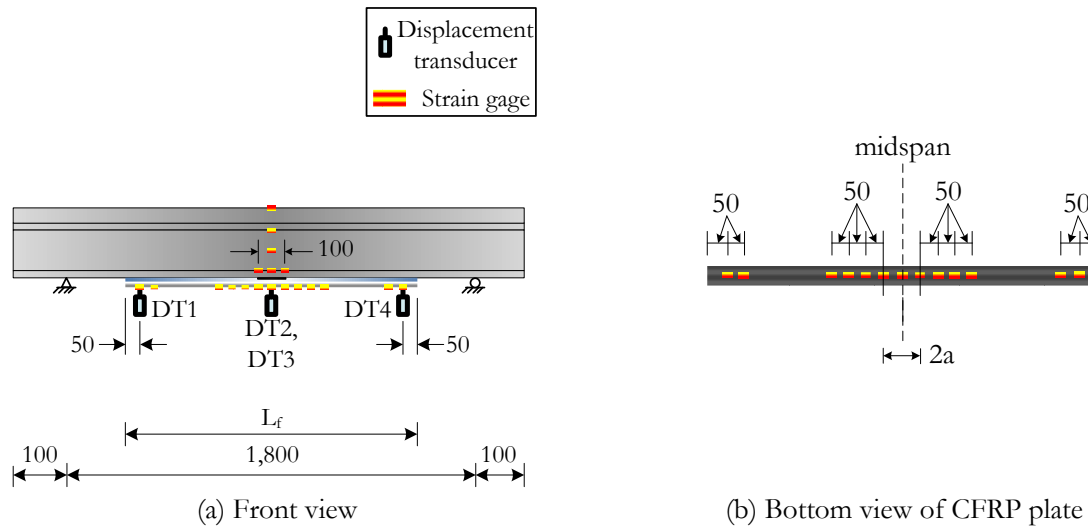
Instrumentation on FRP-strengthened steel beams (all dimensions in mm).
